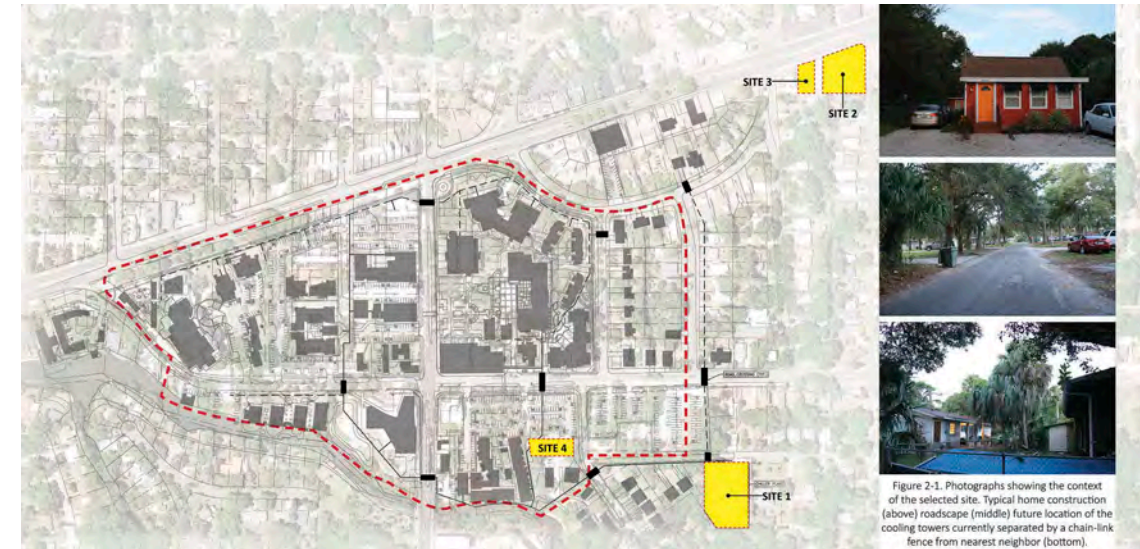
Site plan showing locations of various sites that were considered by the Architect and Client in an attempt to minimize noise impact to neighboring properties. Site 1, the original project site, remained as the project site after the site selection study was conducted because of its central location to existing and future piping network. Site 2 would consist of retrofitting an existing building adjacent to an Art Studio; Site 3 is a parking lot adjacent to an attorney's office; Site 4 is currently a parking lot within the college and is prime land for future expansion.
